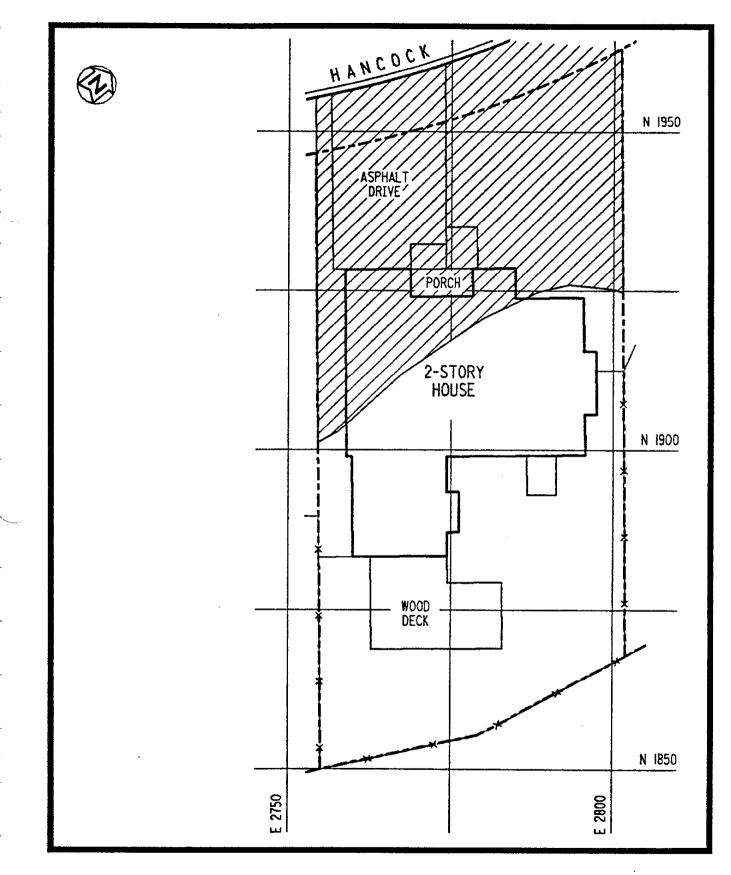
AREAS OF SUBSURFACE CONTAMINATION AT 6 HANCOCK STREET
